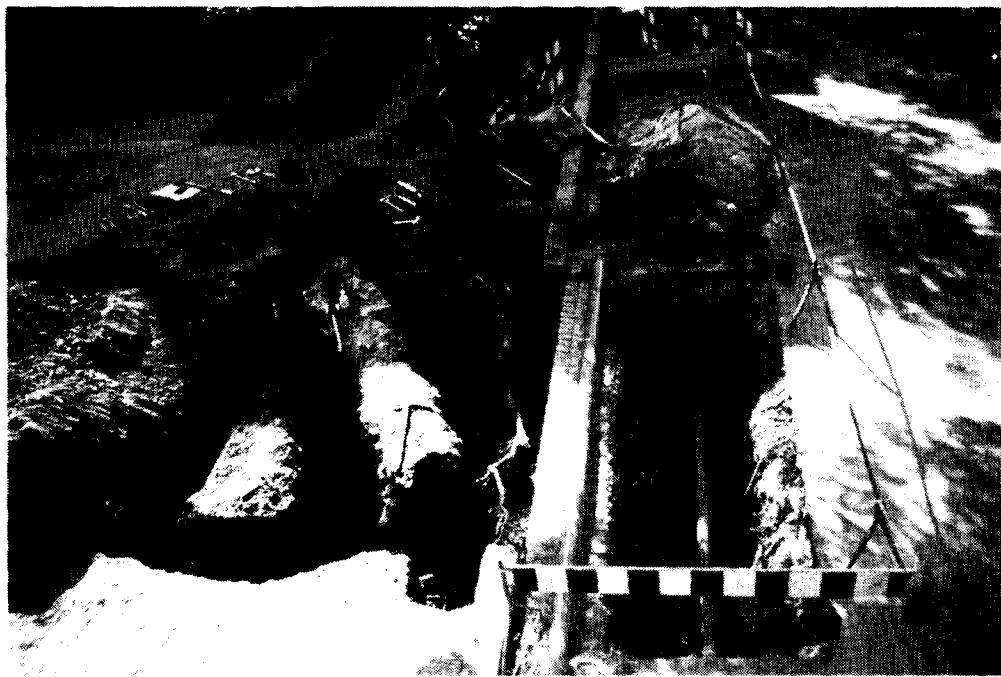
Half sided digging of root system in the plant groove, sidewalk and street area.
